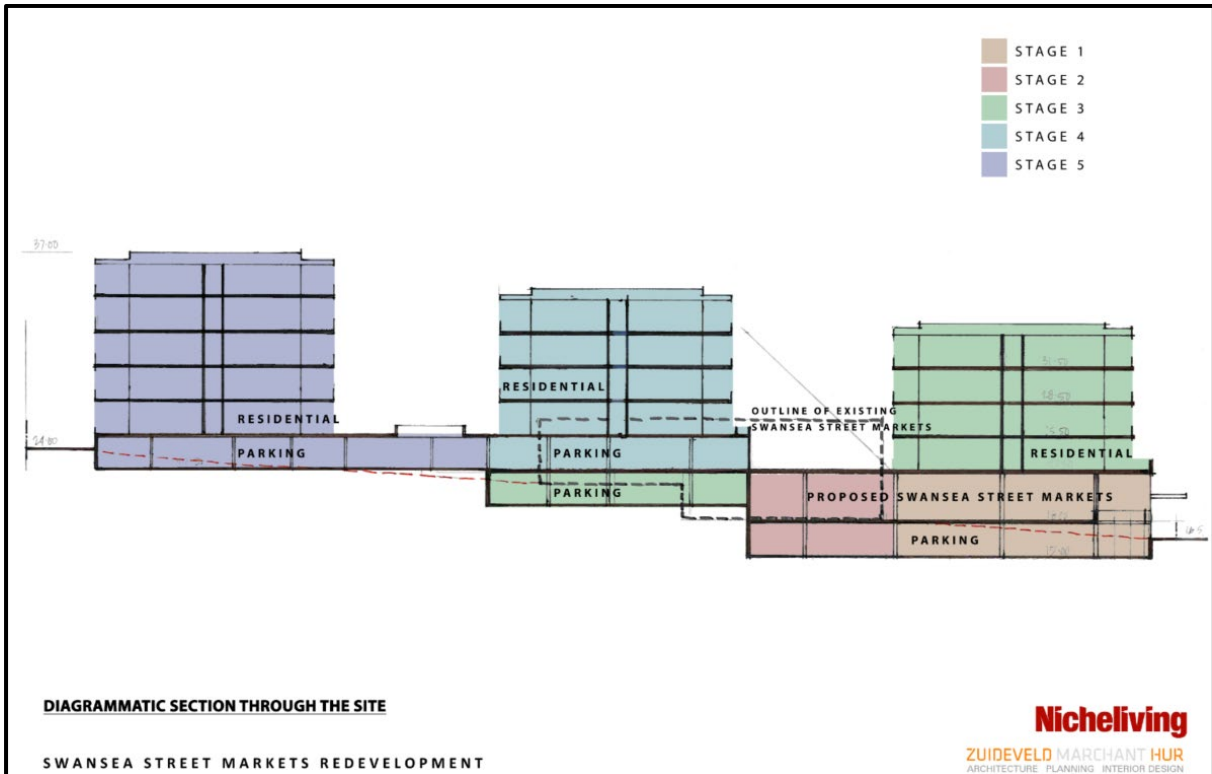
Concept section plan showing the built form outcome of the proposed redevelopment
